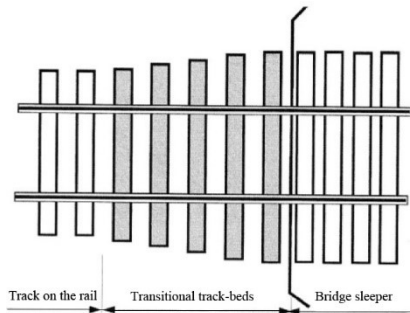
Change in the length of the sleepers at the bridge structure creating a transition zone railway track-bridge [12].
